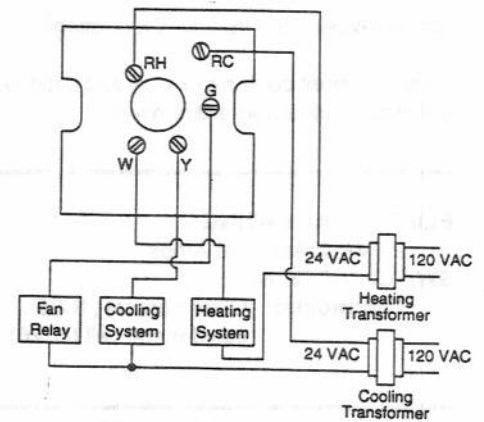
Typical 5-wire (Two-transformer) Heat/Cool Wiring
